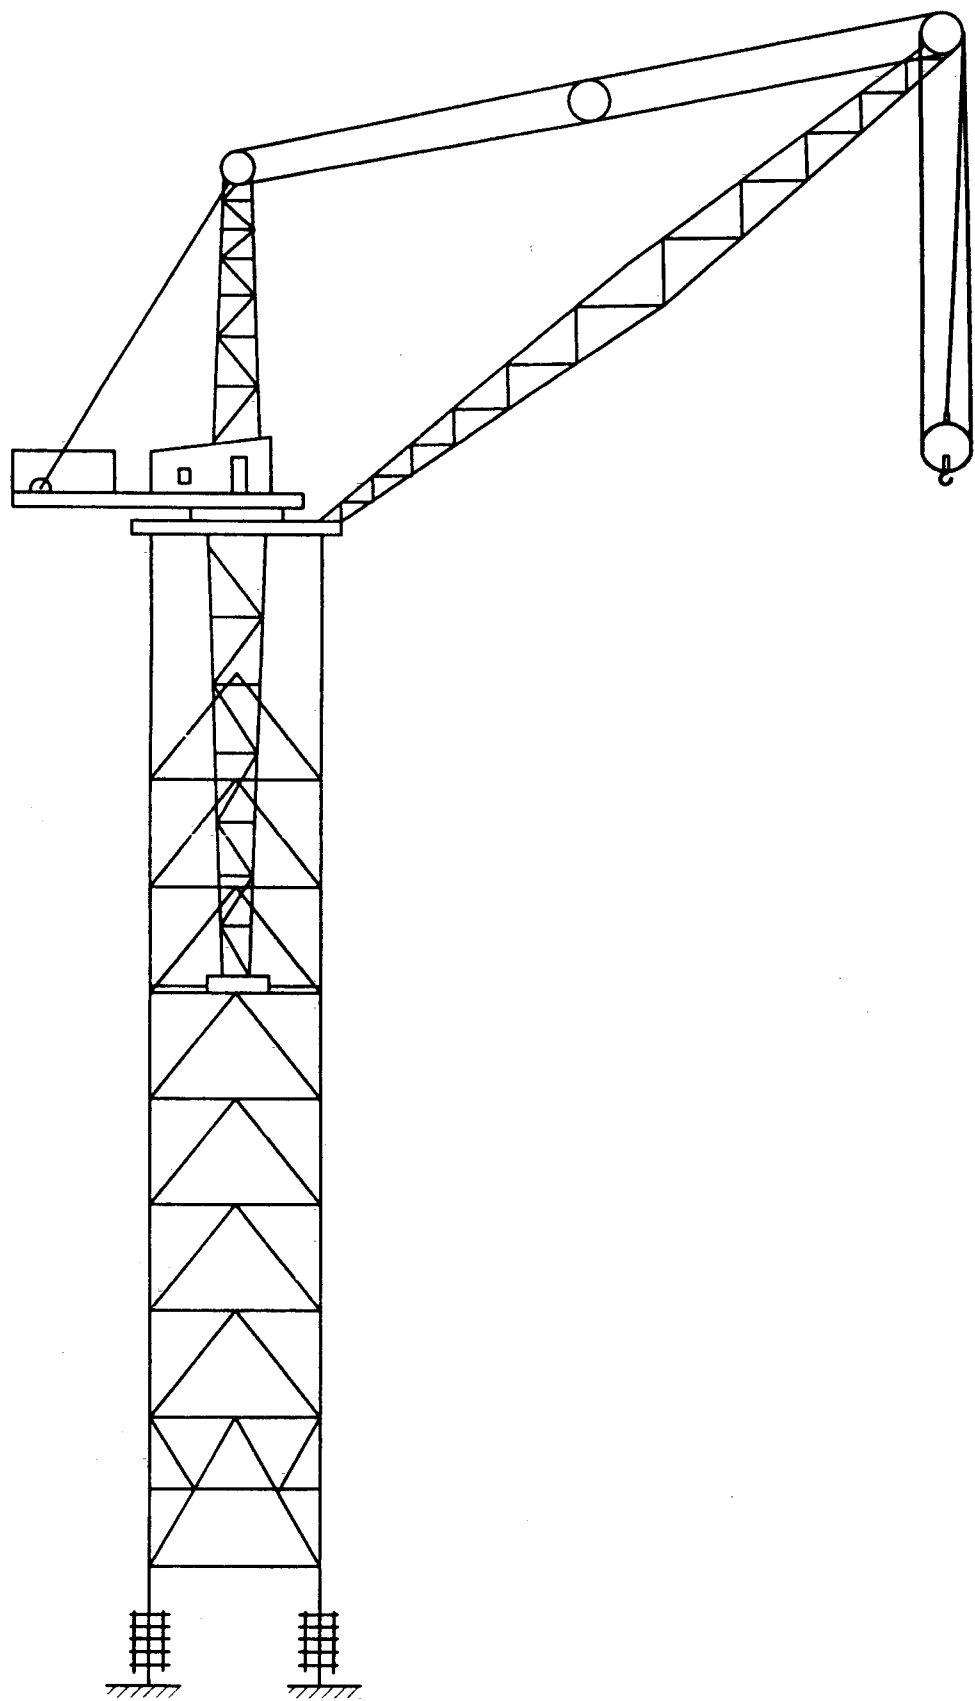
TOWER CRANE OR TOWER DERIRC CRANE
